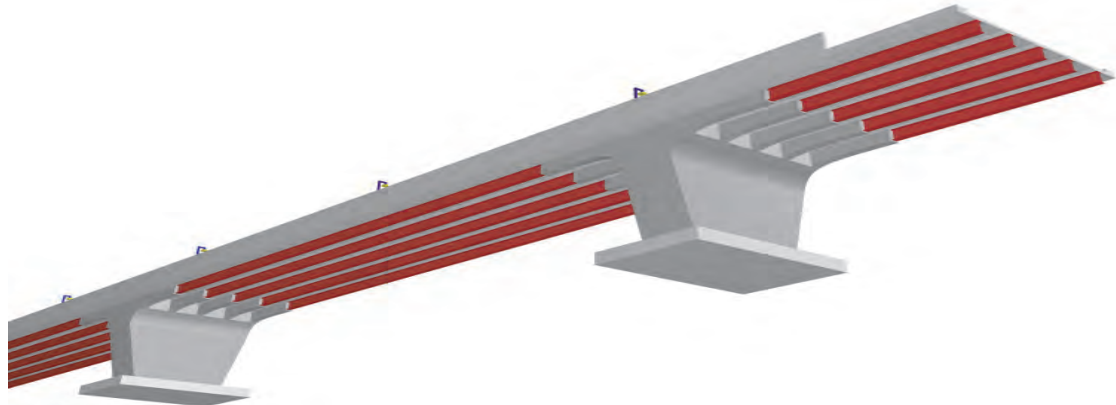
Proposed SRC bridge with rolled steel H-beam pipes
